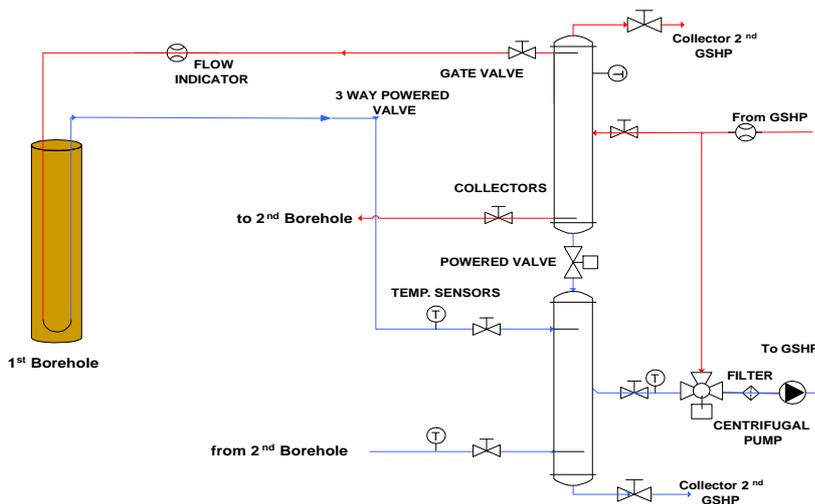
Installation schematic of BHE connection to heat pumps in EST mechanical engineering building
